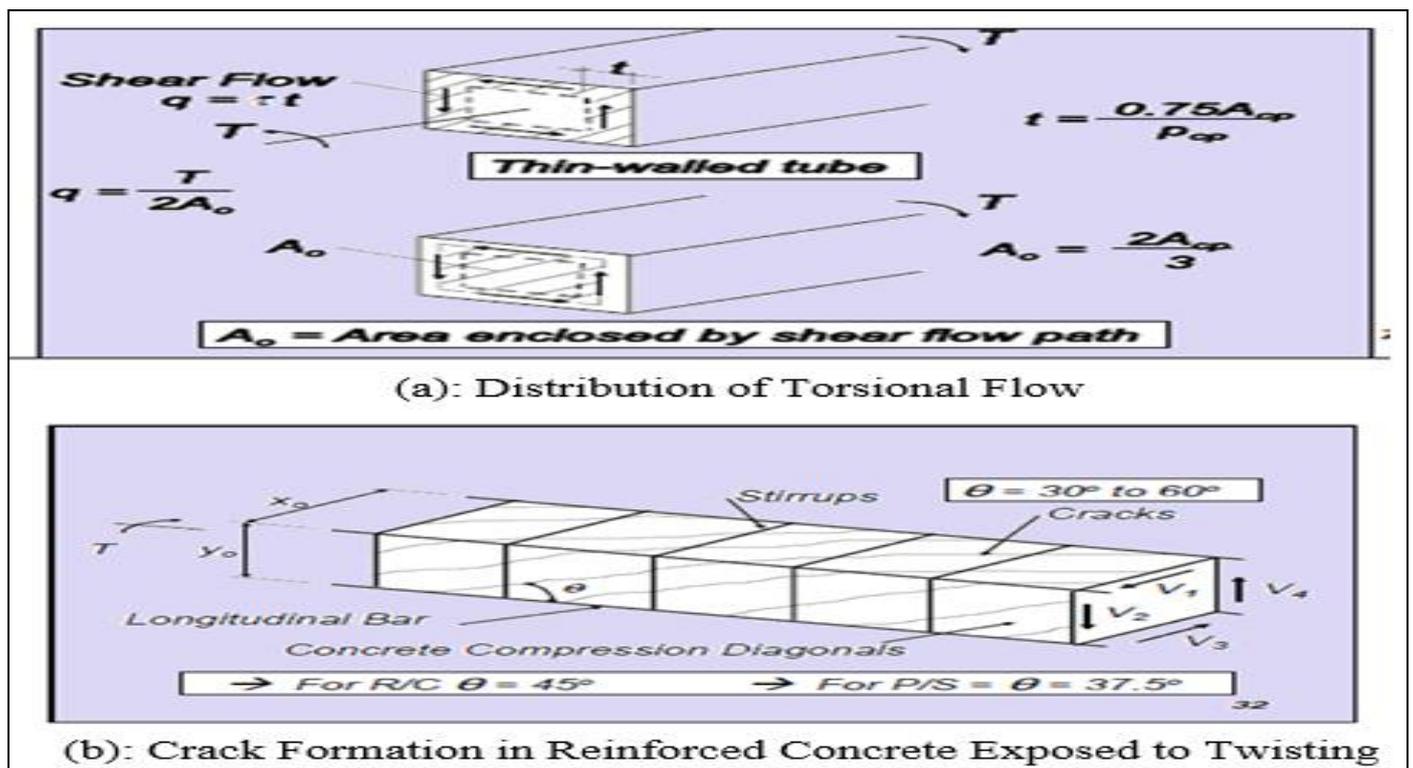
Space Truss Analogy: (a): Distribution of Torsional Flow, (b) Cracks Generation.^[3]
